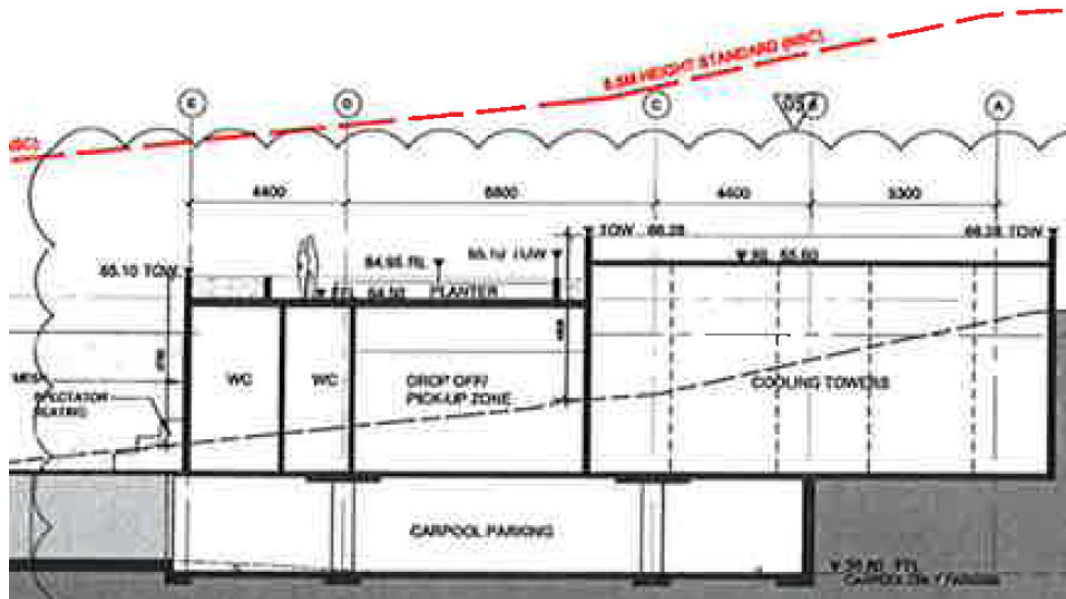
APPROVED Section Through Carpark & Cooling Towers (Source: Stamped Plan, COX, A-DA-4090, Revision 05)
